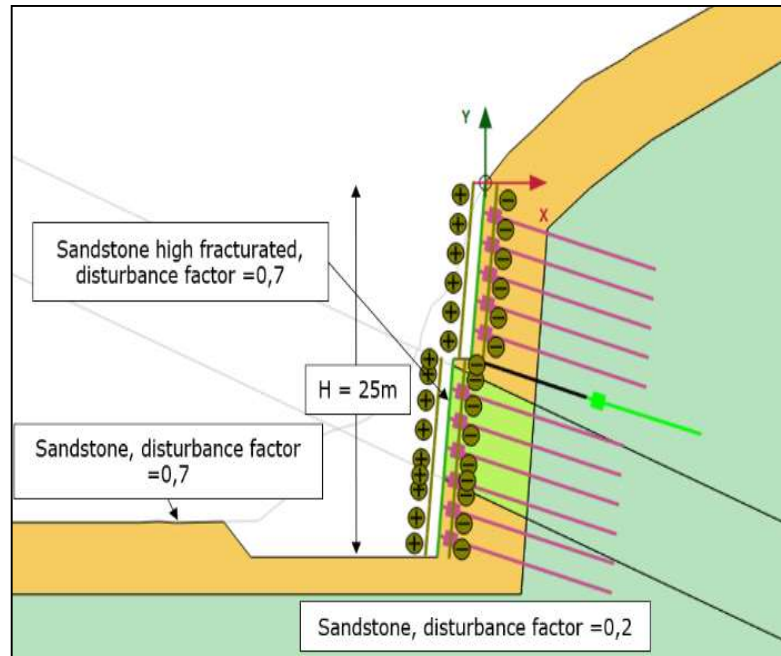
Plaxis 2D - Model Layout - South Section +31.00
